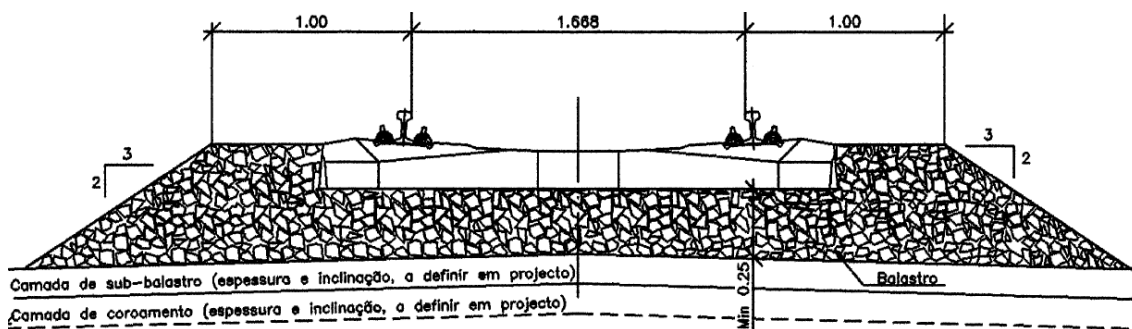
Ballast cross-section for a single-track railway, IT.GER.004, 2004.
